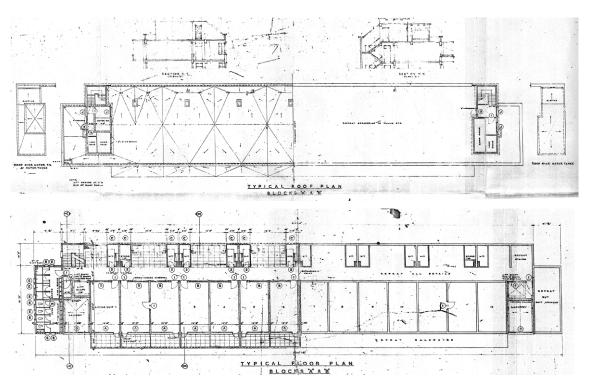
Typical roof plan (above) and floor plan (right) of Block A and B. (Courtesy of Architectural Services Department, Hong Kong SAR Government, Asiatic Police Quarters – Typical Floor & Roof Plans, 1950, drawing no.: A36/3, Microfilm ID: 36804.)
